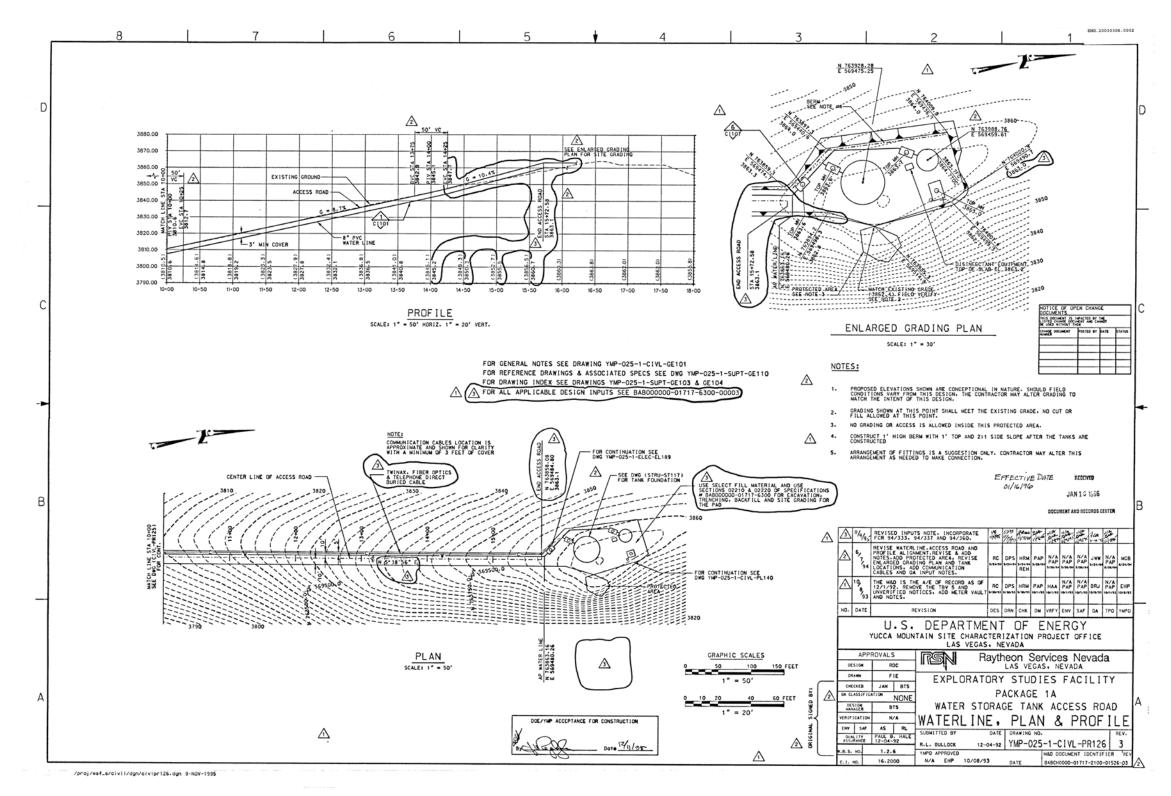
Exploratory Studies Facility Package 1A Water Storage Tank Access Road Waterline Plan & Profile (Sheet 2 of 2)
